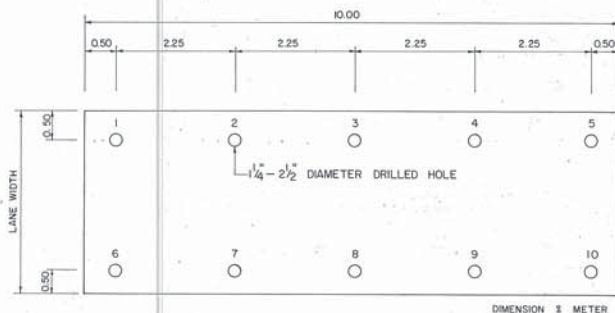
PLAN OF DRILLING FOR CEMENT MORTAR COMPRESSION ALONG THE PUMPING JOINT
